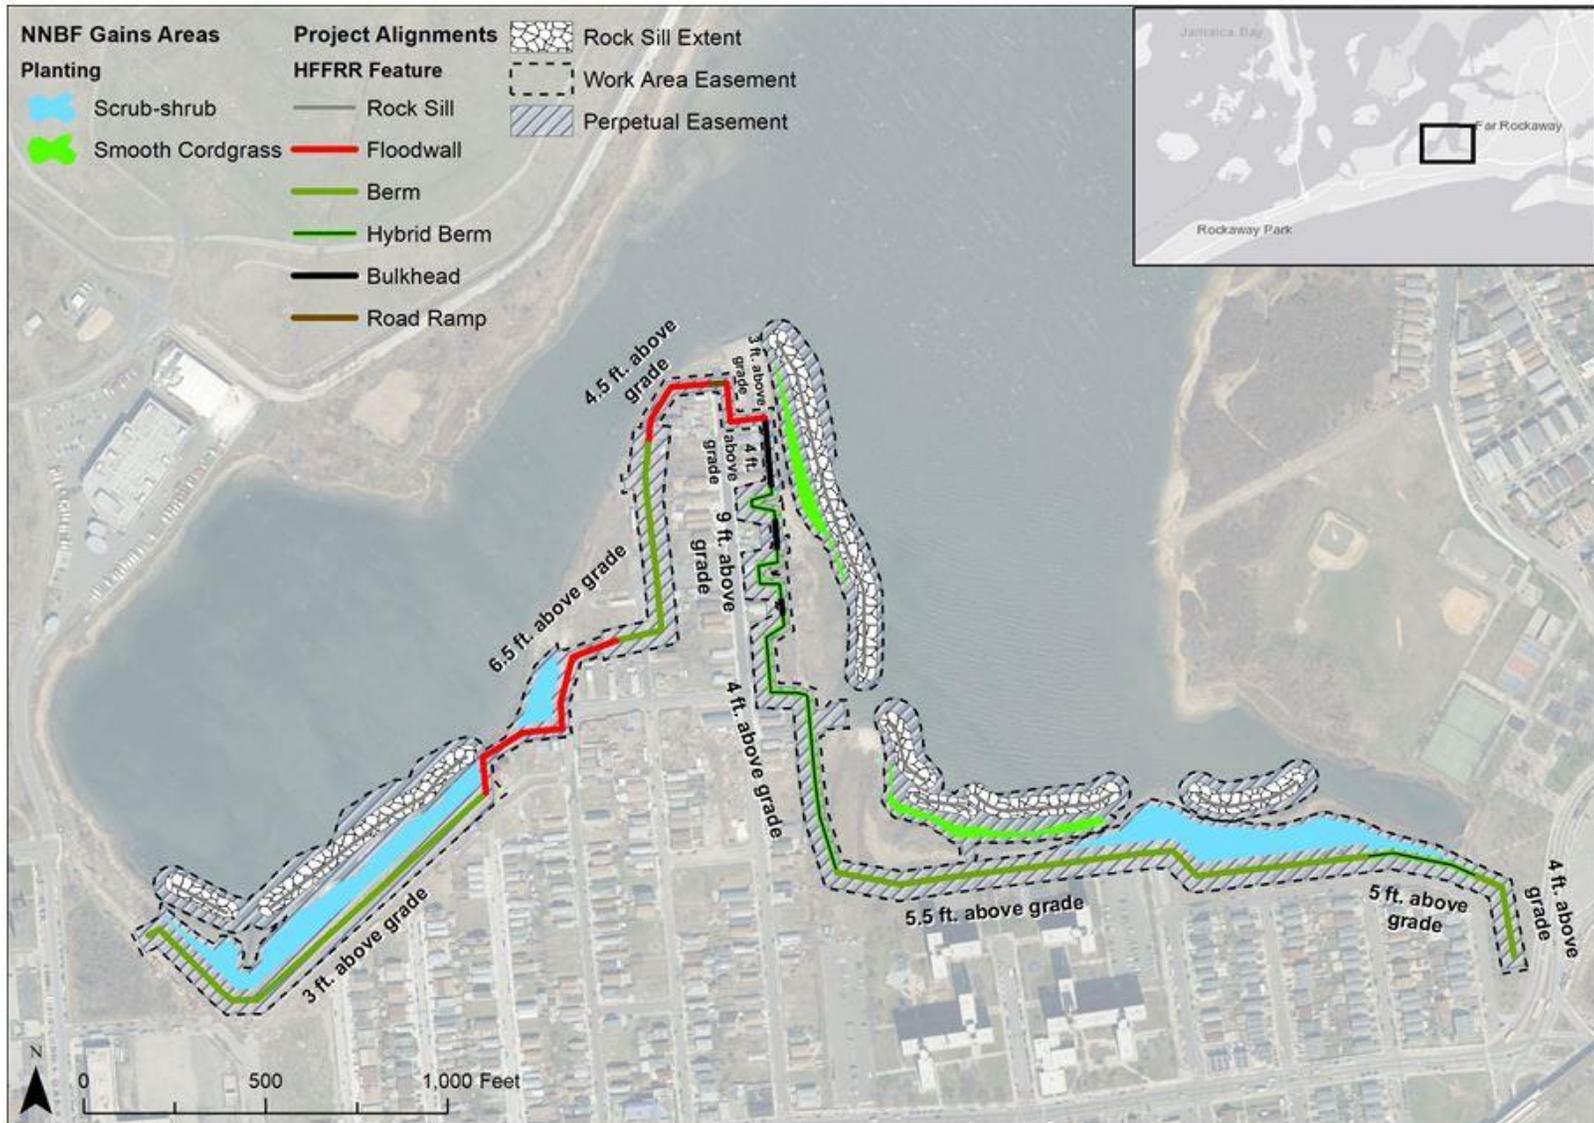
Mid Rockaway – Edgemere Area HFFRRF Project Plan
